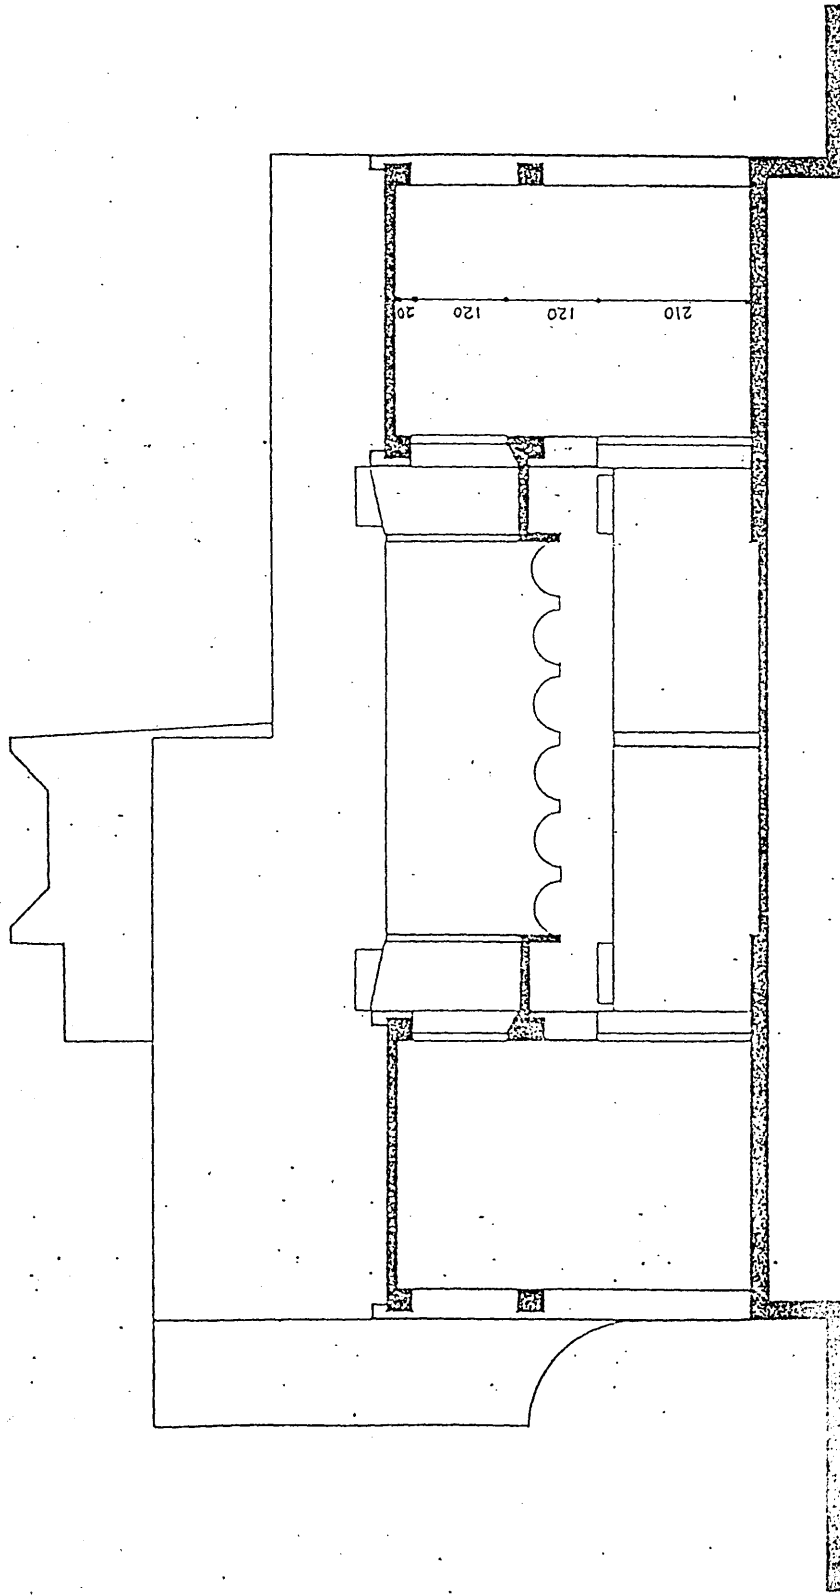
b: Section B-B, through the 3 bedrooms (right) and the 4 bedrooms (left) types. 1/100
